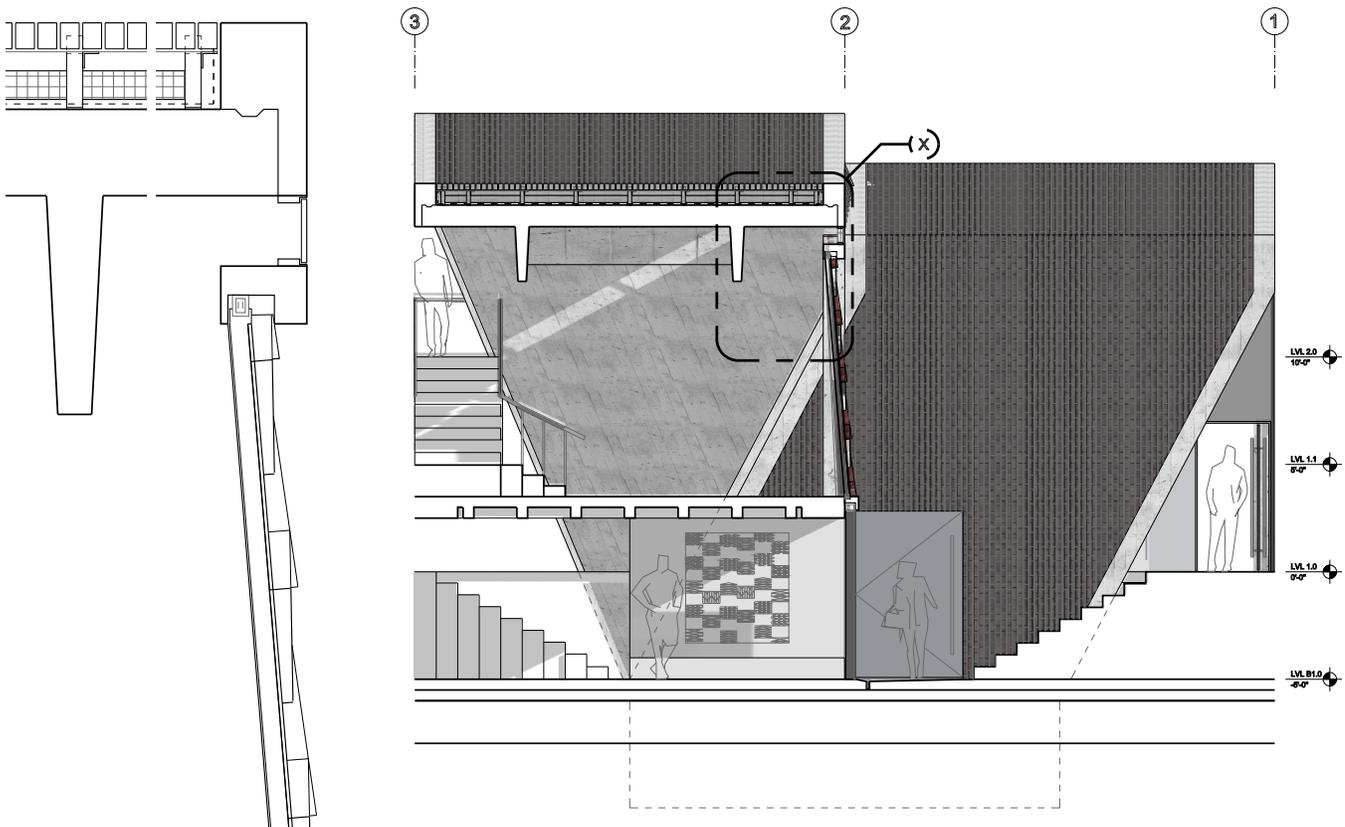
// Translucent Stone Wall Section + Edge Detail (X) // By Ian
